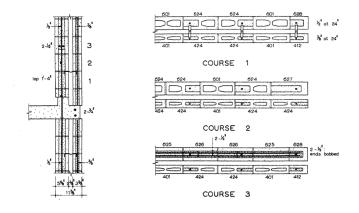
Illustration of a cavity wall. (Holmes, 1965)
